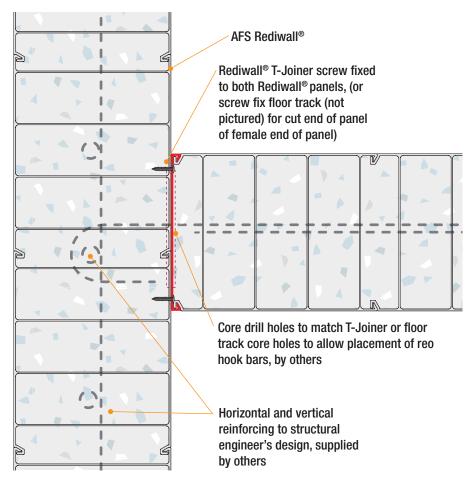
Junction of Rediwall® Party Wall and External Fire Rated Wall
